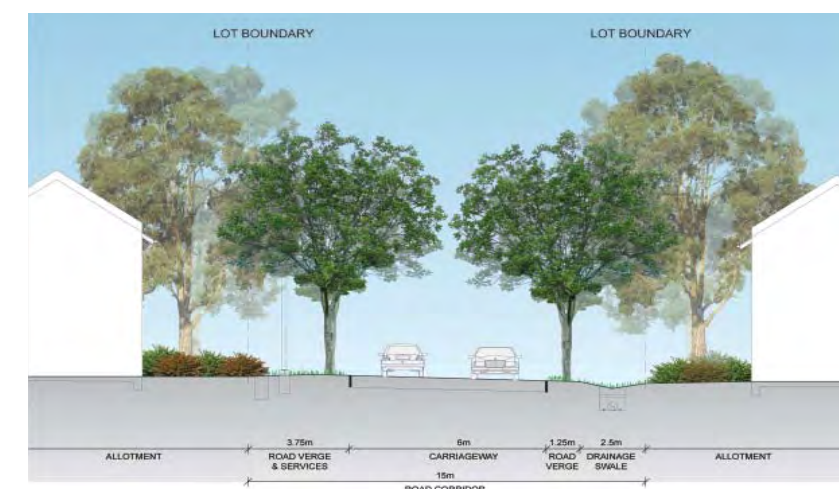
Section D-D through 15 metre Wide Local Road - No Parking.
